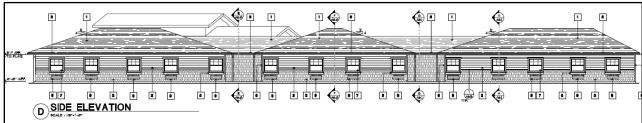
Applicant's Proposed Site Plan, Elevations & Rendering
